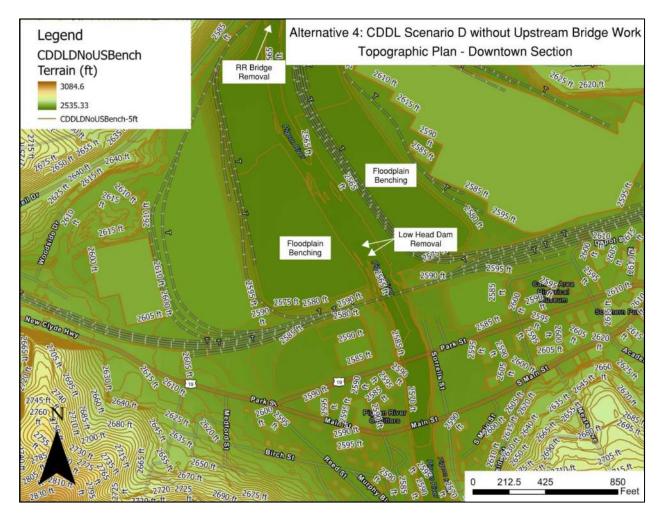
Alternative 4 Topographic Plan Schematic
